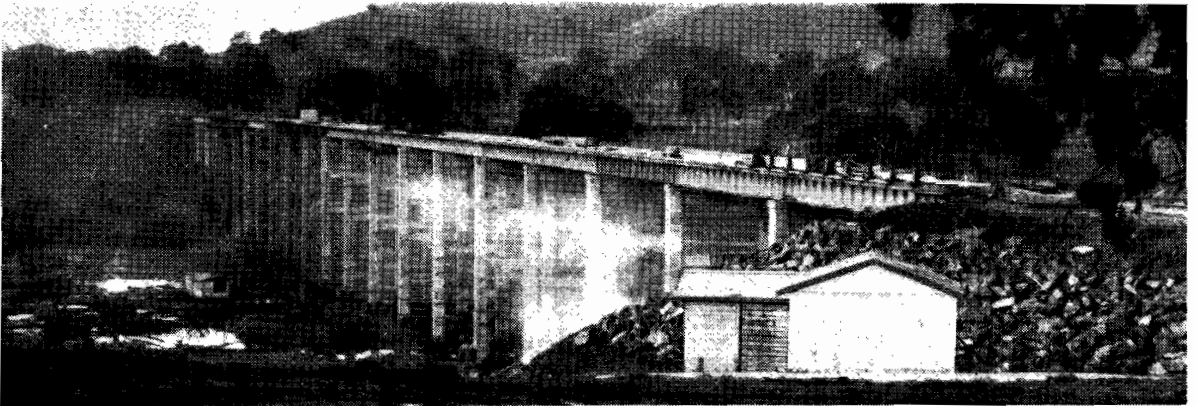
Bridge in course of construction over Brankeet Creek, at Bonnie Doon.
